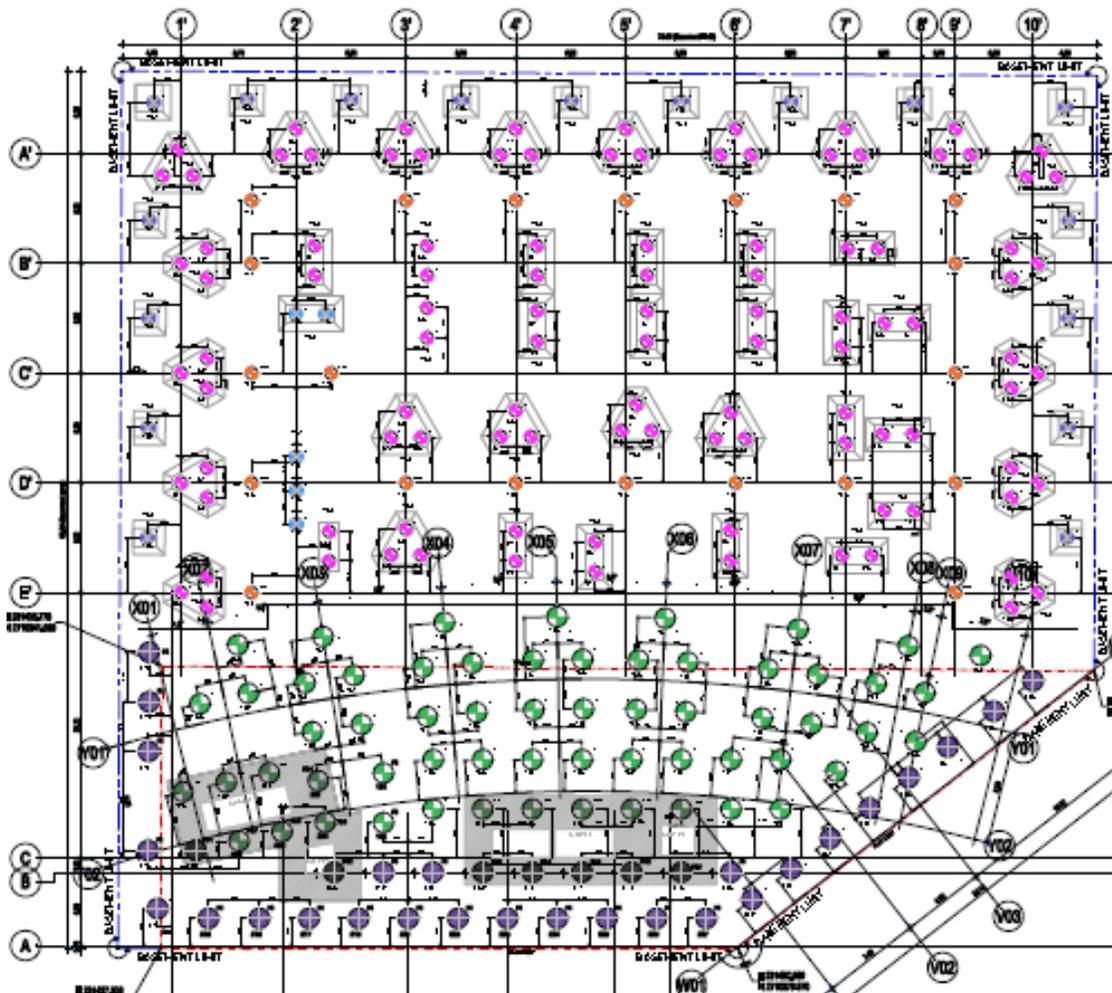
ADM Approved pile layout for the Mixed-Use Development Tower
